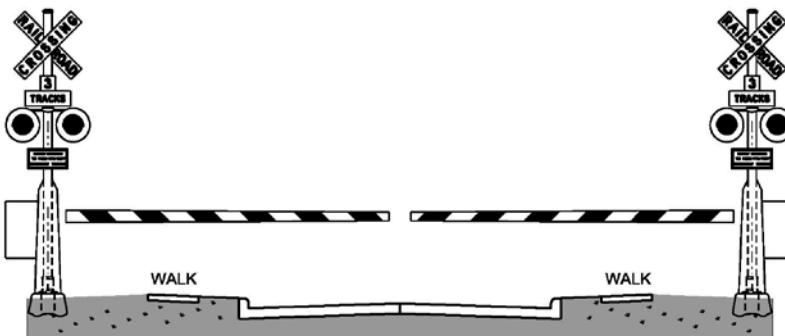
Typical 4-Quadrant Gates with Sidewalks
